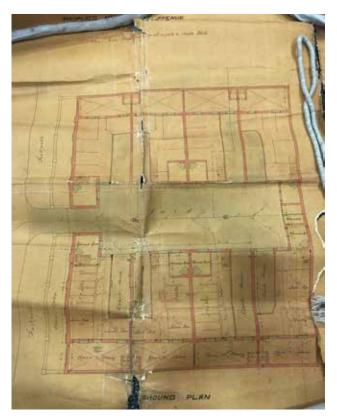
, a badly damaged site plan, shows that the mews were arranged around an enclosed yard with an opening on the west side onto First Avenue. A drawing of the west elevation shows the return wall of No. 1 St John's Place and No. 56 First Avenue, which were designed as mirror images of each other, in yellow brick with three blind arches at ground floor level and a single sash window at first floor level with a pitched dormer roof [Plate 5]. At the front of Nos. 1 and 56 the elevations stepped out to flank the entrance to the mews, while at the rear there were single storey return walls decorated with recessed panels and brick parapets. The ground floor plan in Plate 6 suggests that there were low walls in front of these two buildings, which enclosed them from the pavement. These elevations were designed to form part of the townscape and complement the Italianate houses on First Avenue, while the internal elevations, which were largely concealed from the street, were plainer and were constructed of contrasting pink/red brick with timber-boarded carriage and stable doors.
